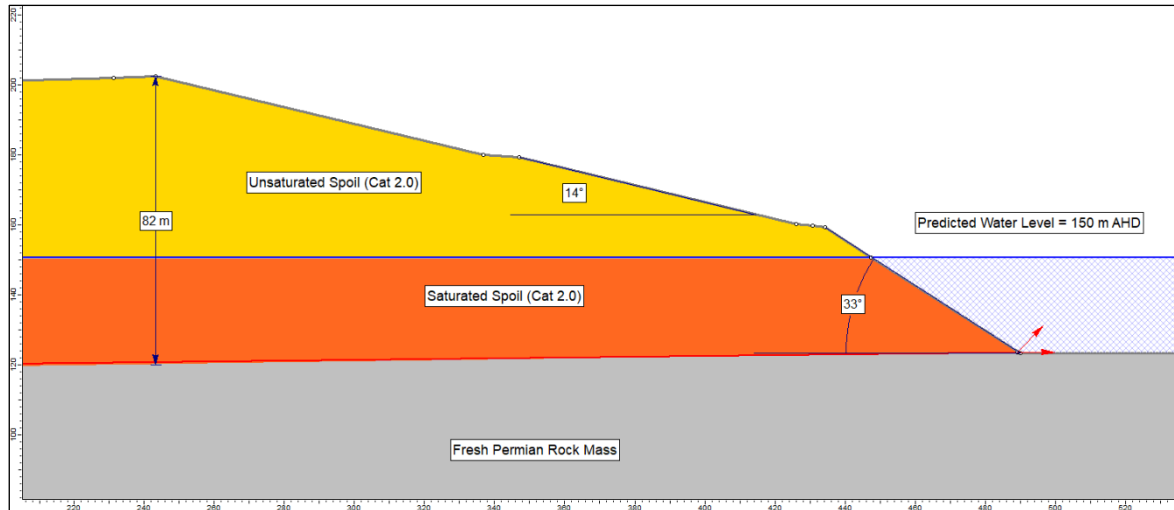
Lowwall Spoil Dump - Section 7 (Northeast Facing)
